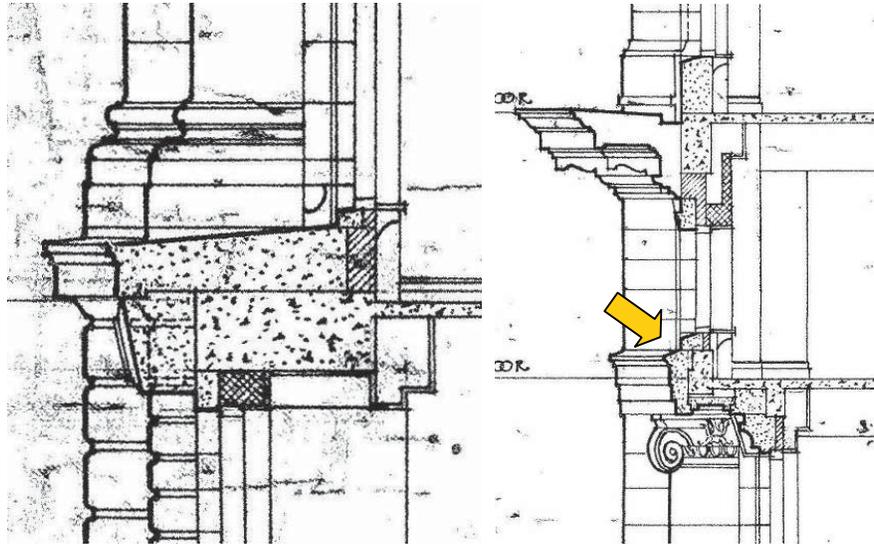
and 40 Southeast corner of 1st floor, as shown in the original architectural (p. 3) and structural (p. 22) drawings.
